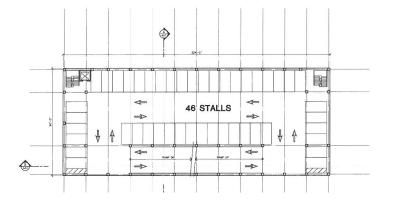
City-Funded Test Case 1— Parking Layout, Plaza 3
